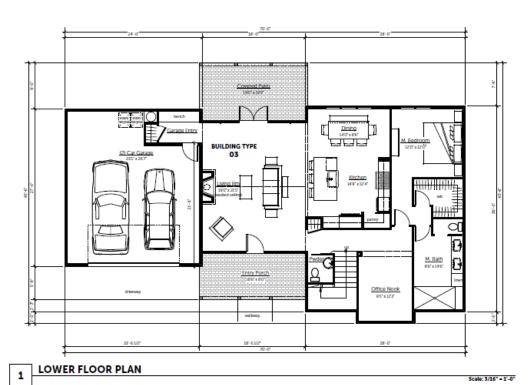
EXHIBIT E: ELEVATIONS / FLOOR PLAN
